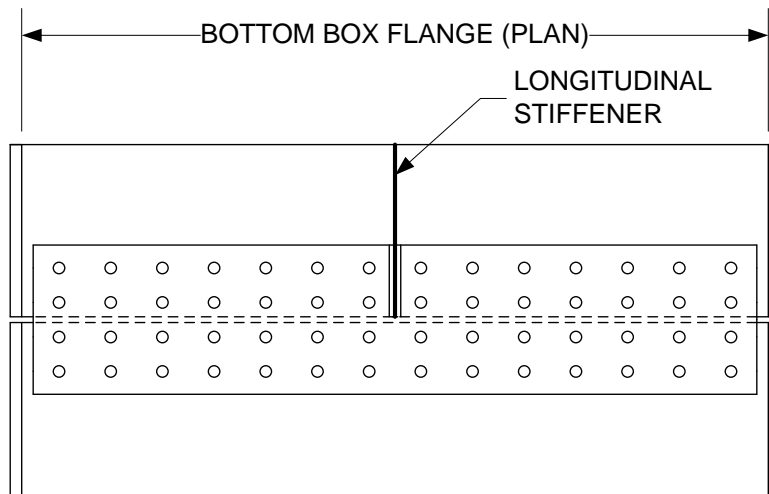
Suggested Bottom Flange Bolted Splice Detail at a Flange Stiffener Termination
